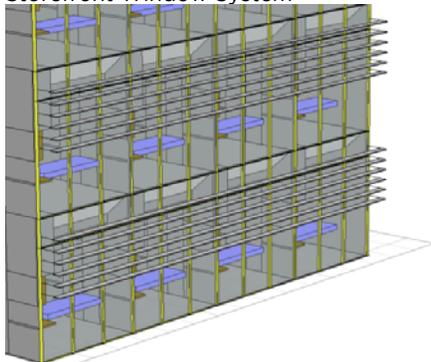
Horizontal Louvers on 3/3 WWR Full Height Curtain Wall System
